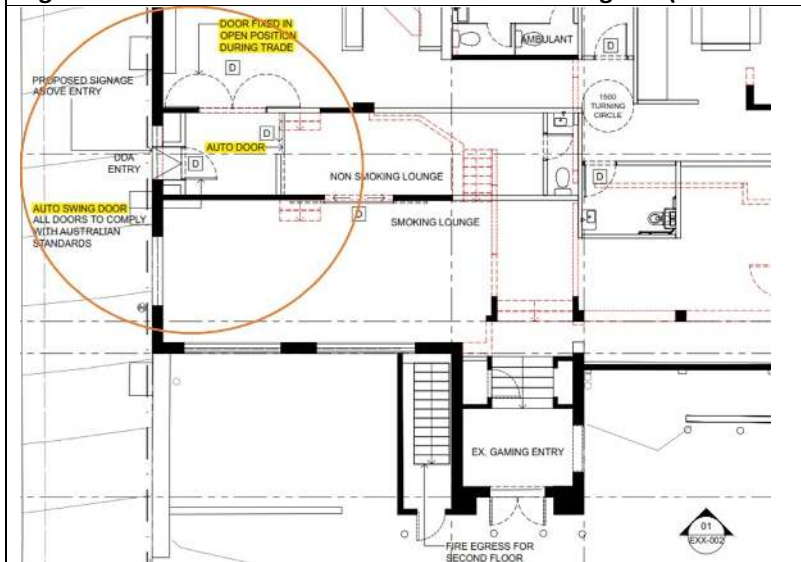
Extract from Caterbuild Site Plan Drawing 100 (dated 29-04-20) (30 Gaming Stations?)
